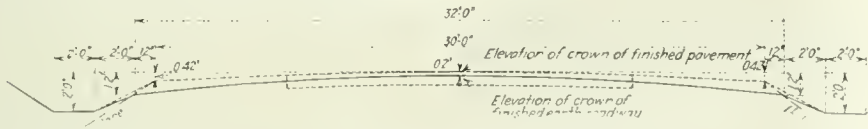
SPECIAL EARTH ROAD SECTION FOR GRADING ROADS TO BE PAVED IN ILLINOIS.
